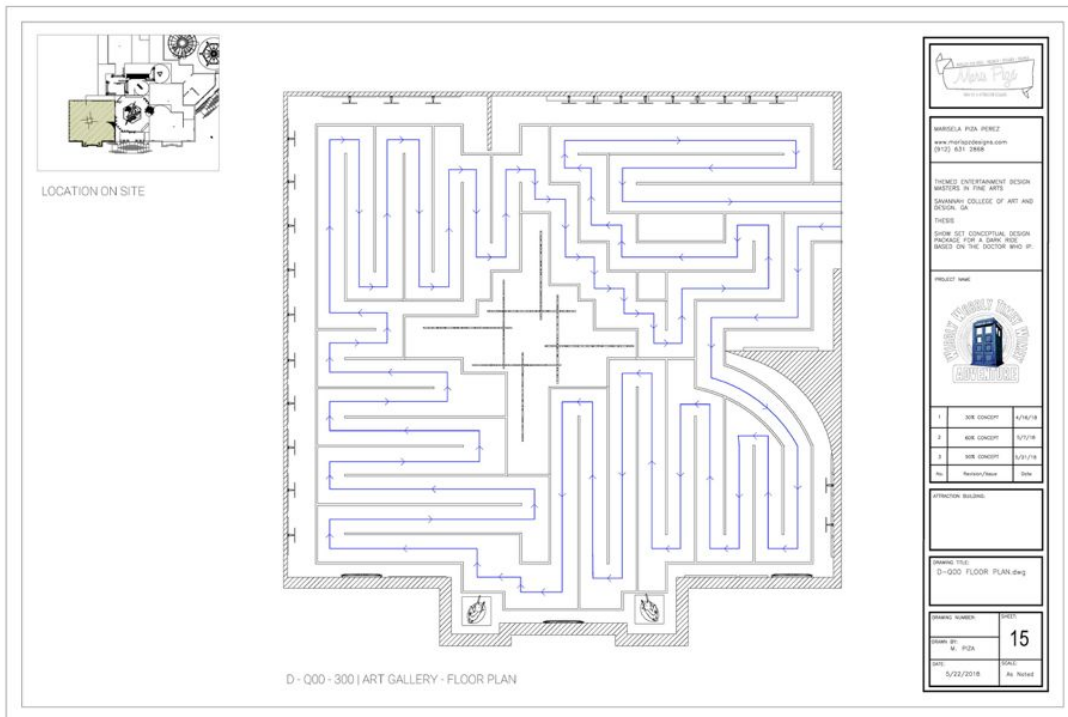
D-Q00-300 | Art Gallery - Floor Plan
